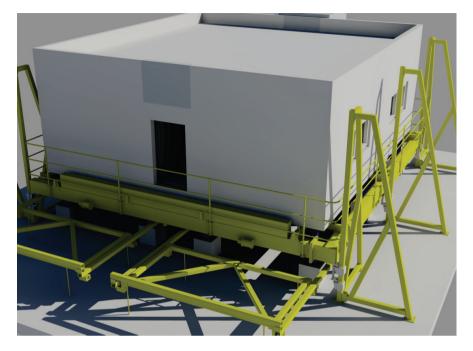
Grid position before lifting the building [Routine 1: R1.C]
